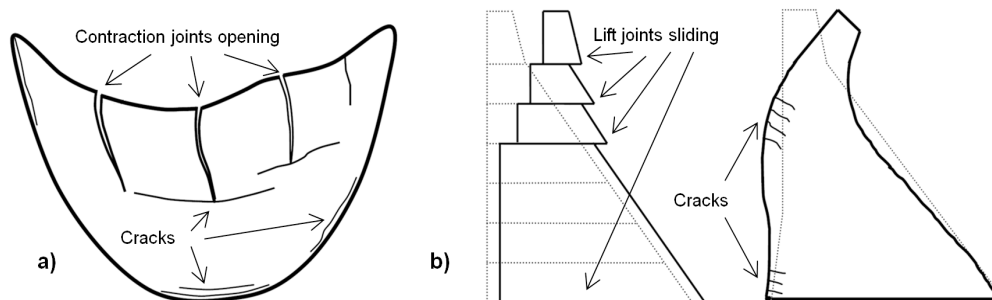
Illustration of failure modes related to casting joints.
